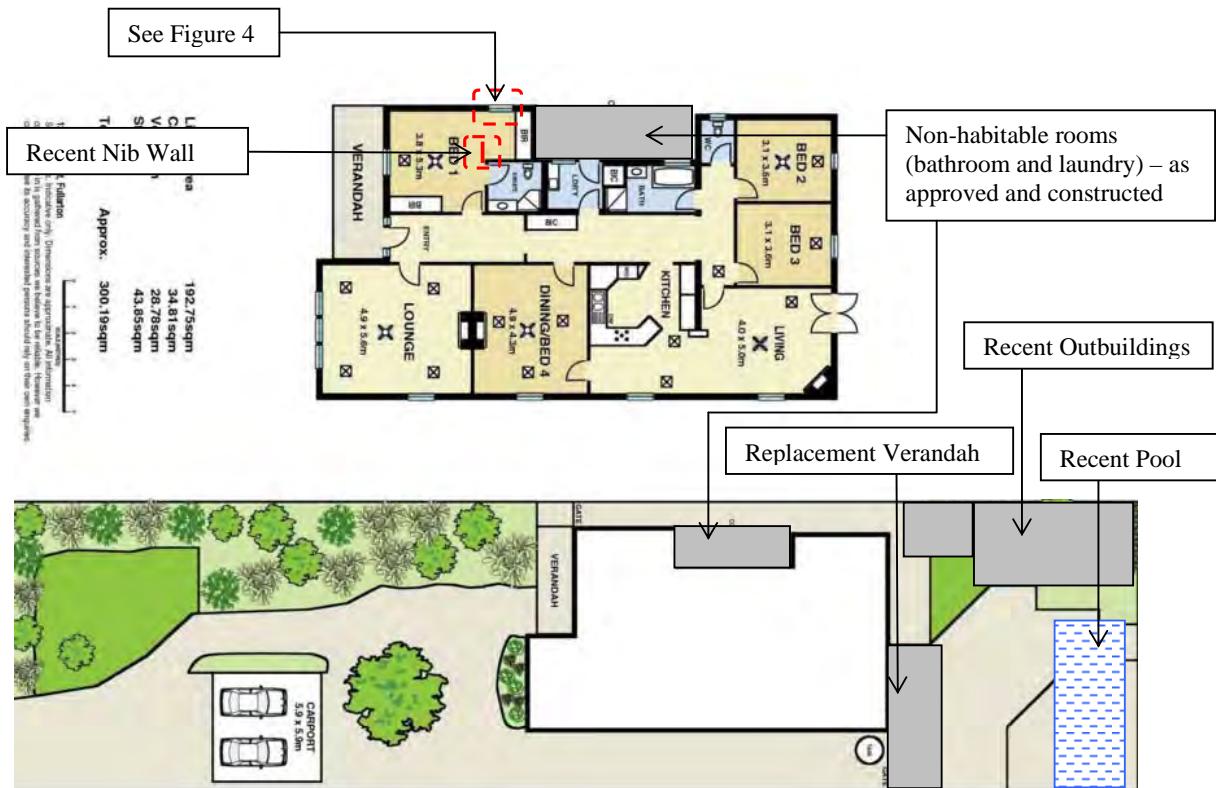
Site and Floor Plan of 13 Frew Street, Fullarton (not to scale)
